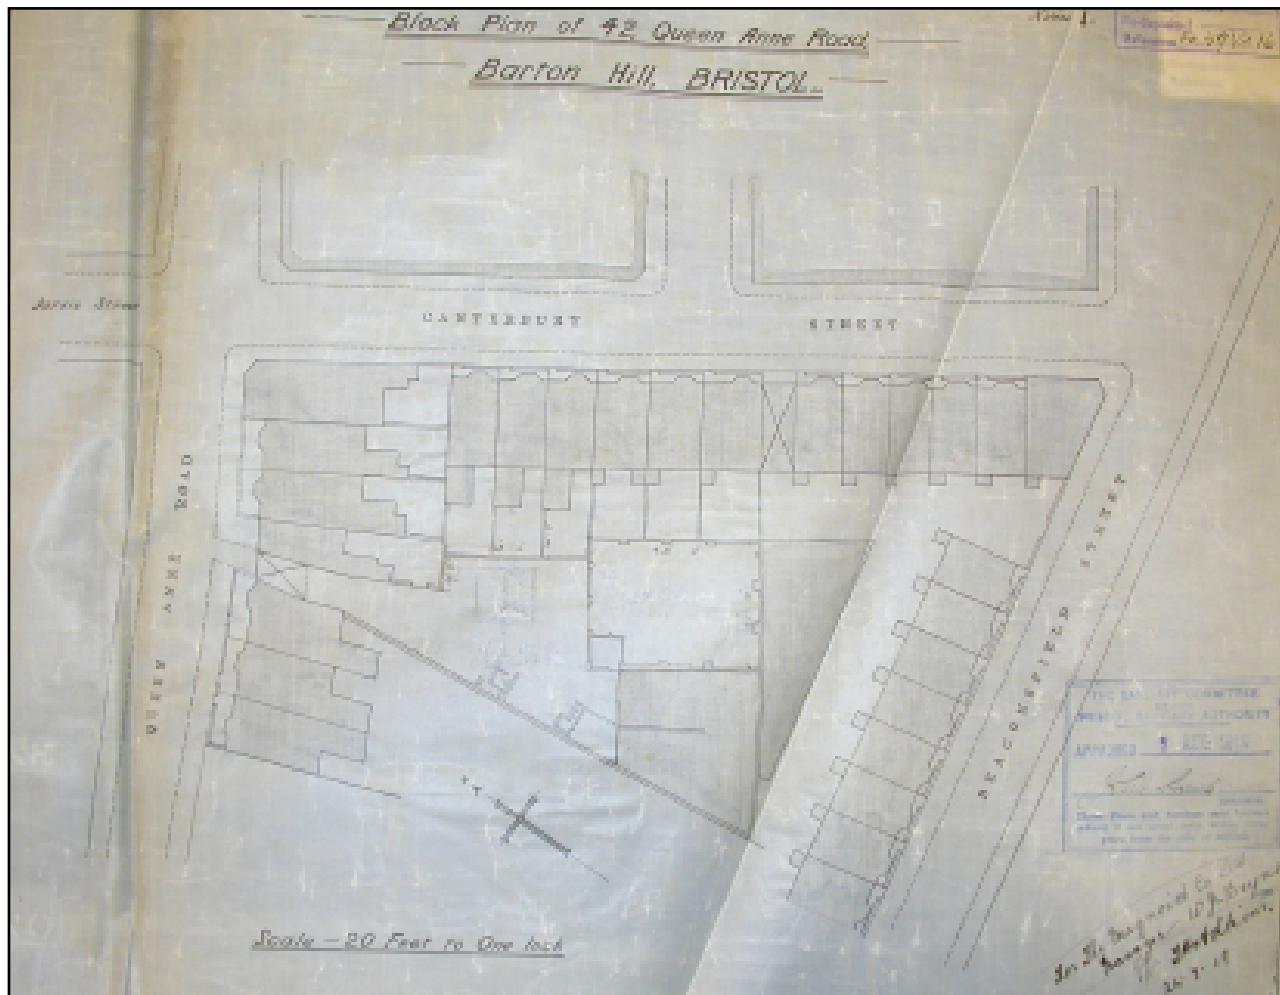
Plan dated 26th July 1919 showing location of Magnoid Company engineering works (BRO Building Plan Book Vol 16 folio 49)
